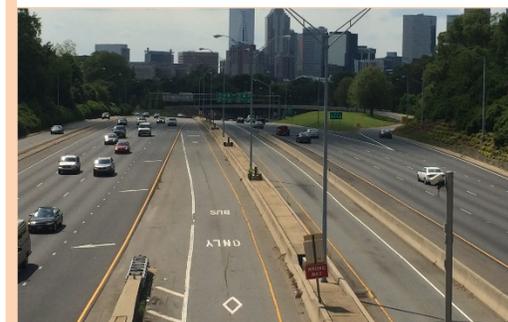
Existing Bus Lanes and East Bound U.S. 74
